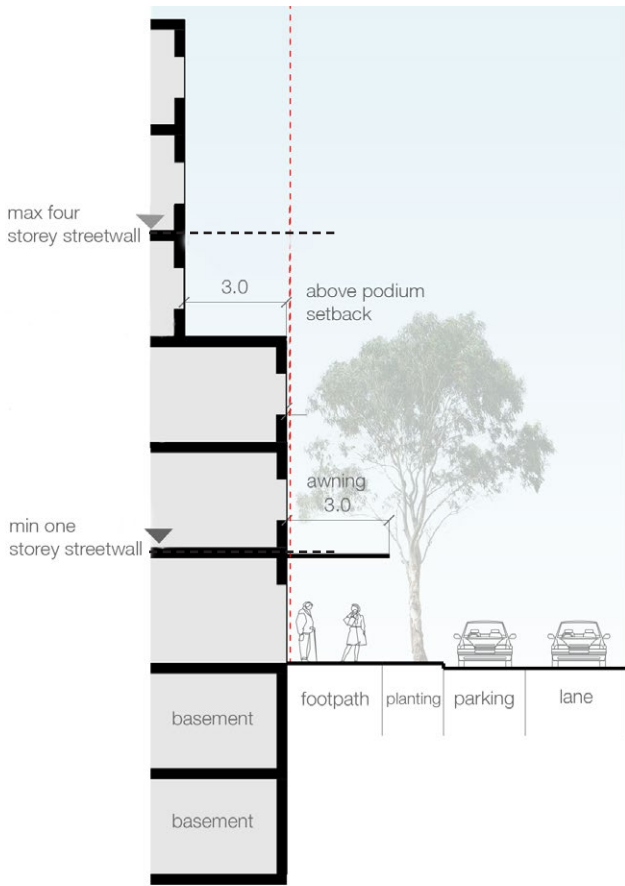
Proposed town centre building interface condition with retail uses at ground floor
